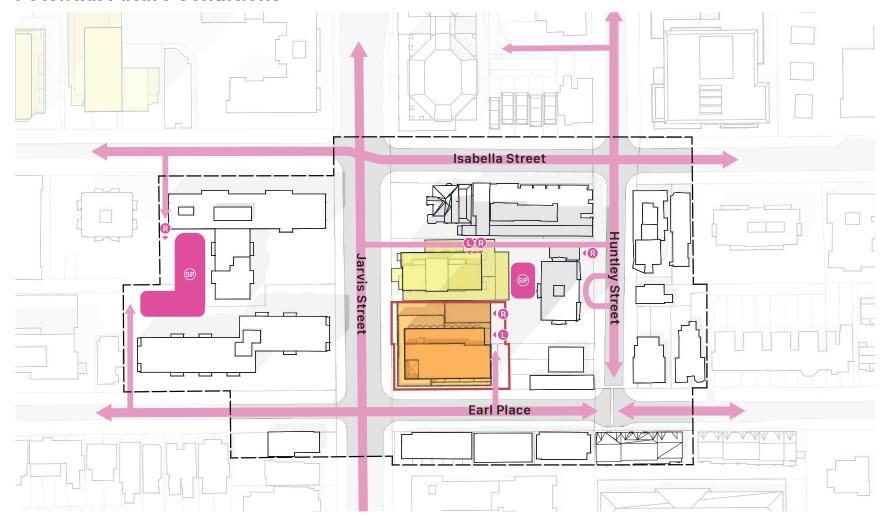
Vehicular Circulation and Access to Parking and Loading
